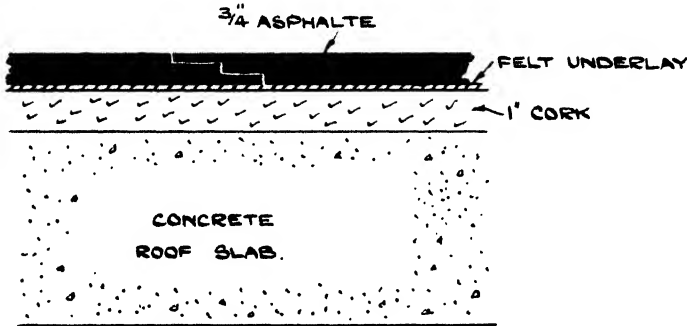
TYPICAL WATERPROOFING AND HEAT INSULATION FOR CONCRETE ROOF SLAB
